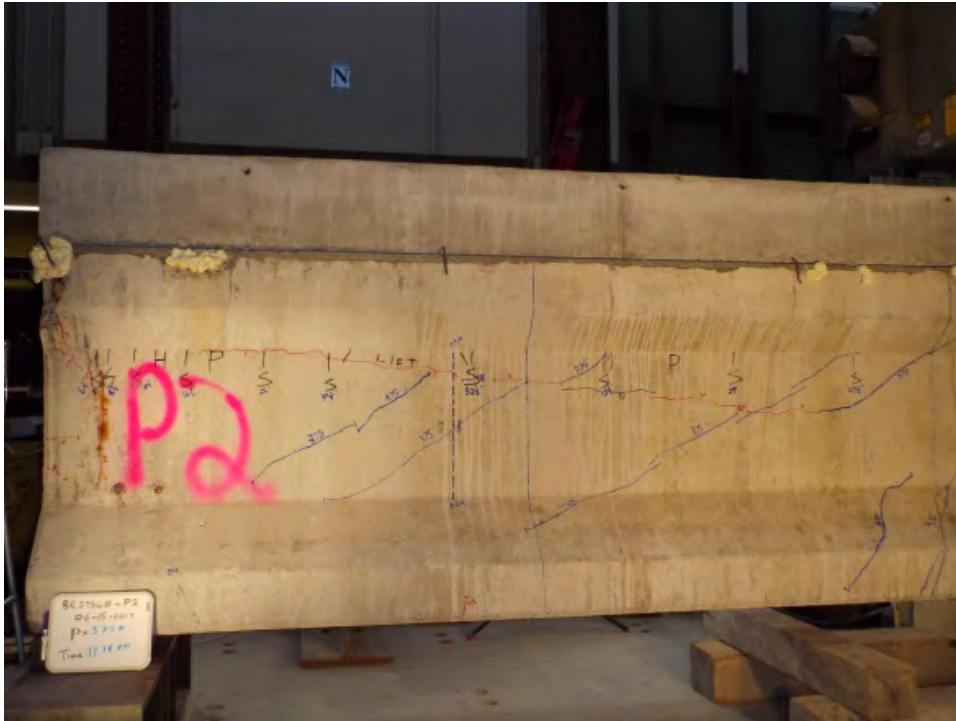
Girder P2 web shear cracking $P= 375$ k
